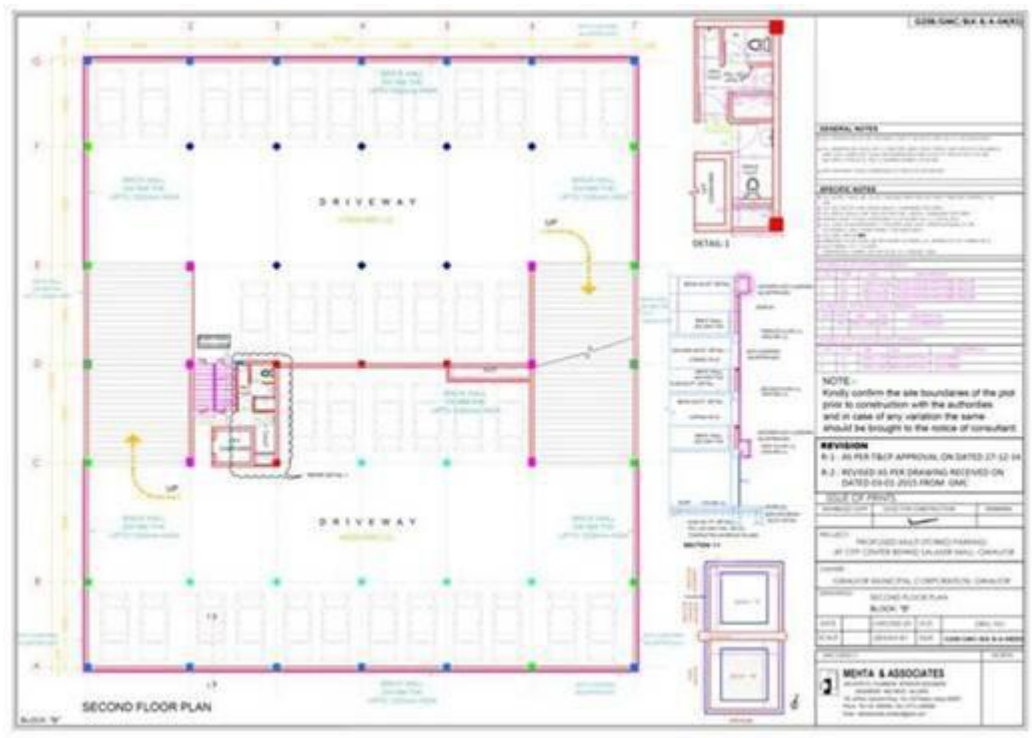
Parking Location: Salasar MultiLevelParking (Second Floor-Block B)
